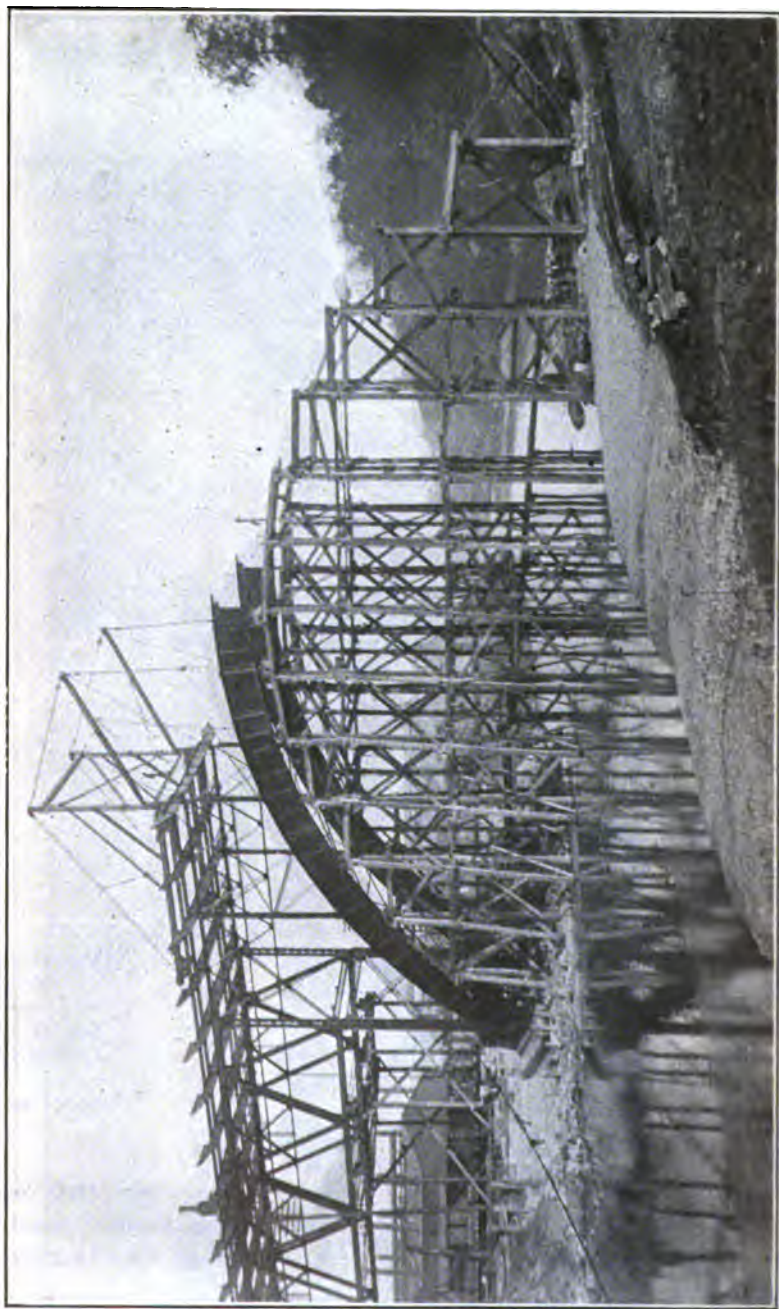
PLATE GIRDER ARCH ERECTION SHOWING SKEW-BACK.
